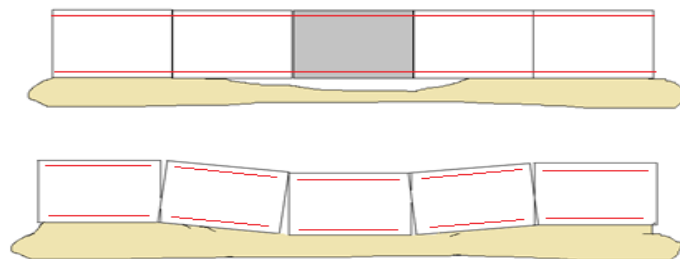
Segments of an immersed tunnel after the prestressing wires are cut [3]
